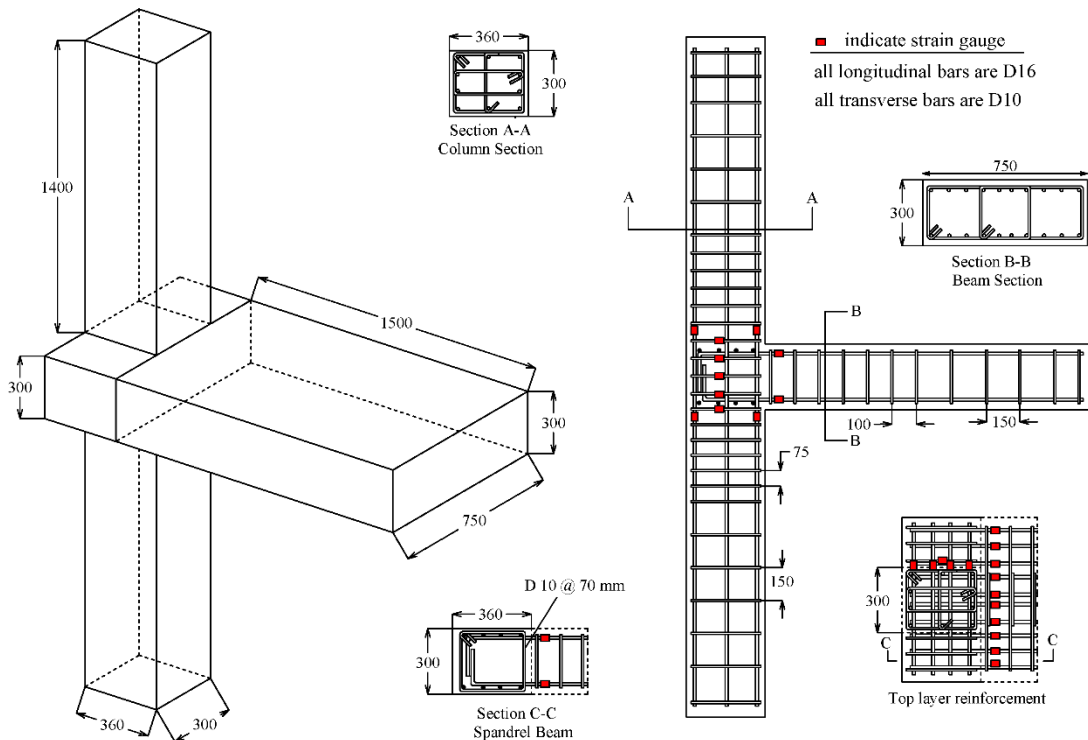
Dimensions and reinforcement details of specimen S4 (unit: mm).
